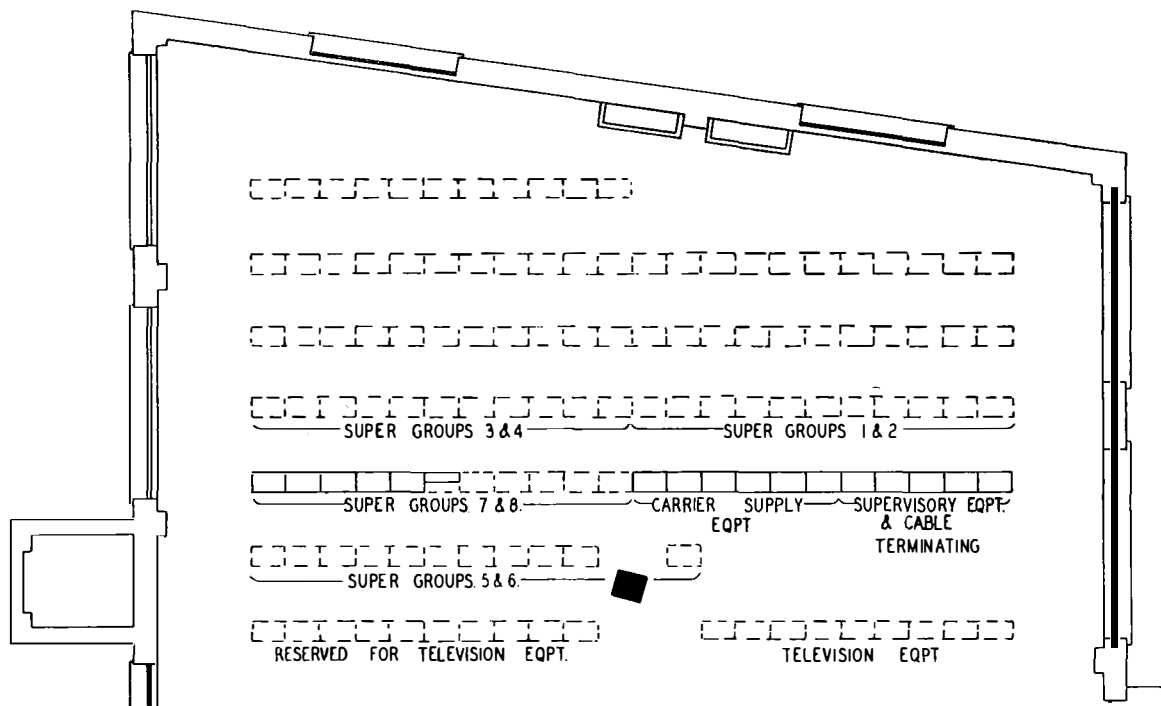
RACK LAYOUT, BIRMINGHAM TERMINAL STATION.
